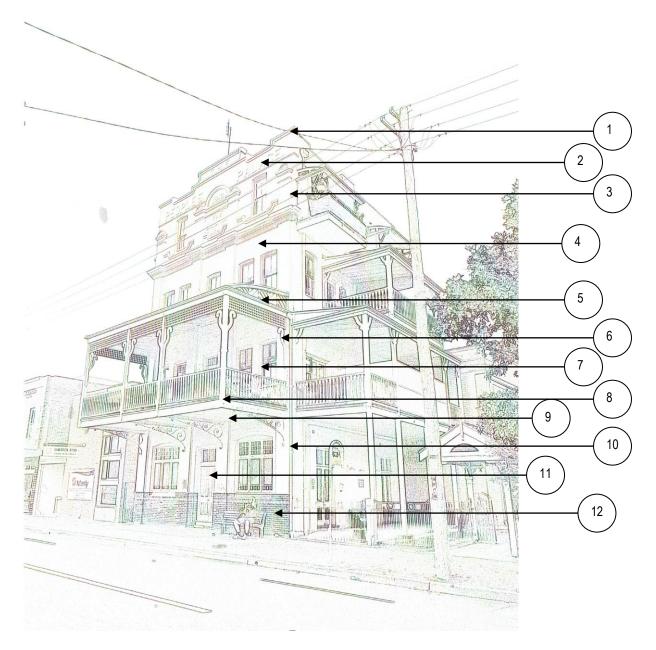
Potential Colours for the People's Palace – Scheme C (marked on an edited photograph)
